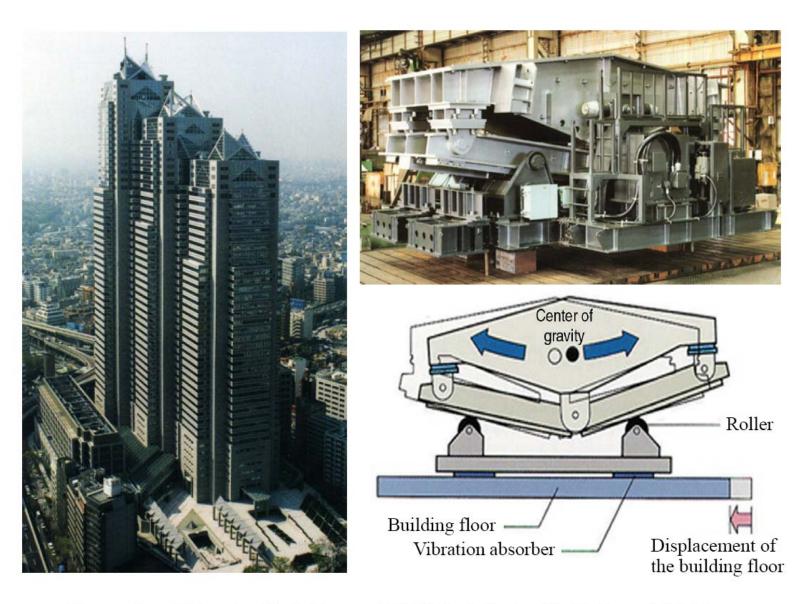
Shinsuku Park Tower (1993) installed with V-shaped HMDs.
